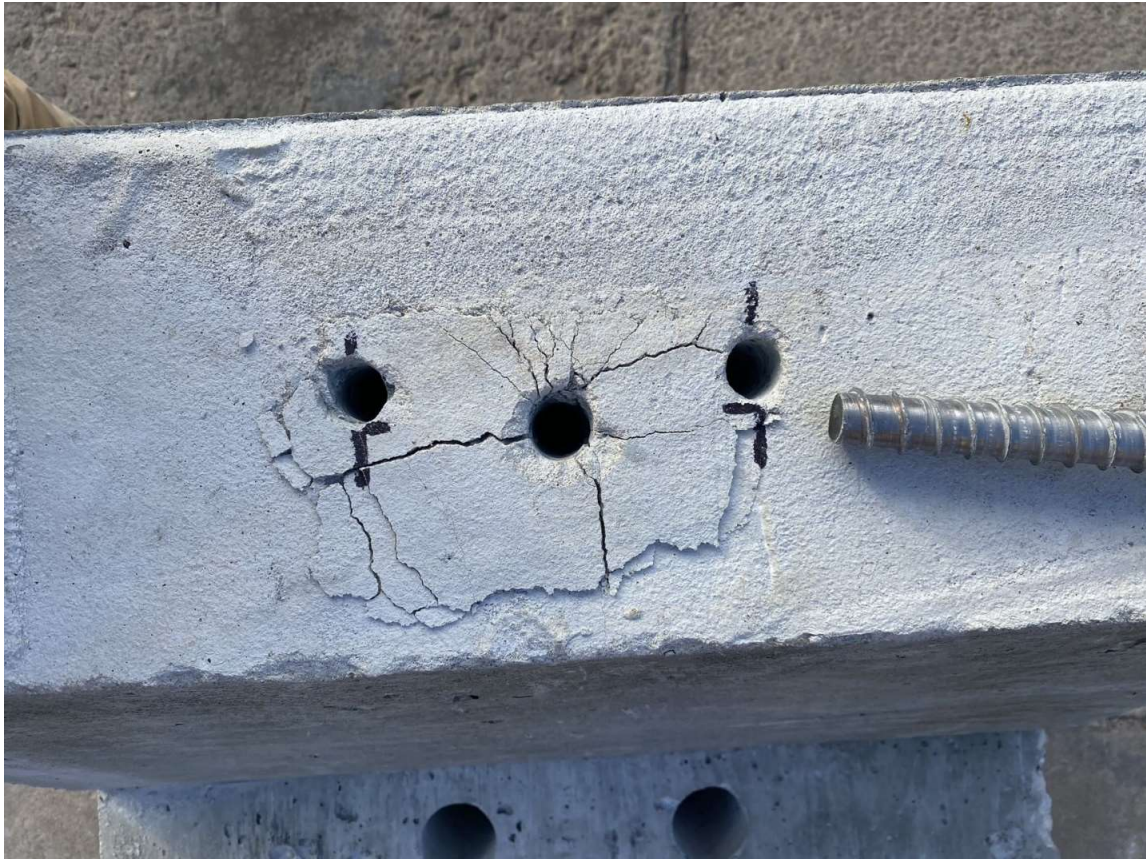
P-G1-1 specimen concrete after anchor breakout
